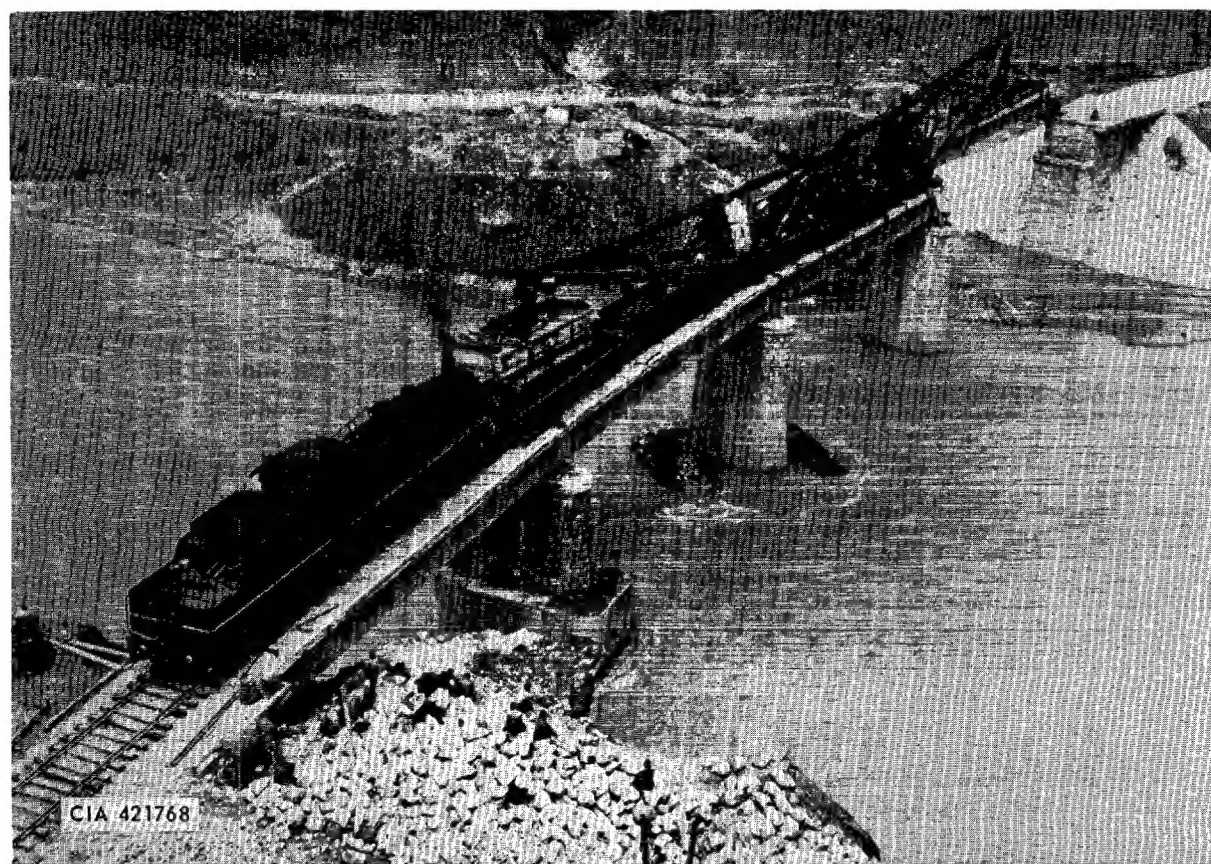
RAIL CAR-MOUNTED CANTILEVER CRANE, LAN-CHOU/CHING-HAI RAIL LINE, CHINA
